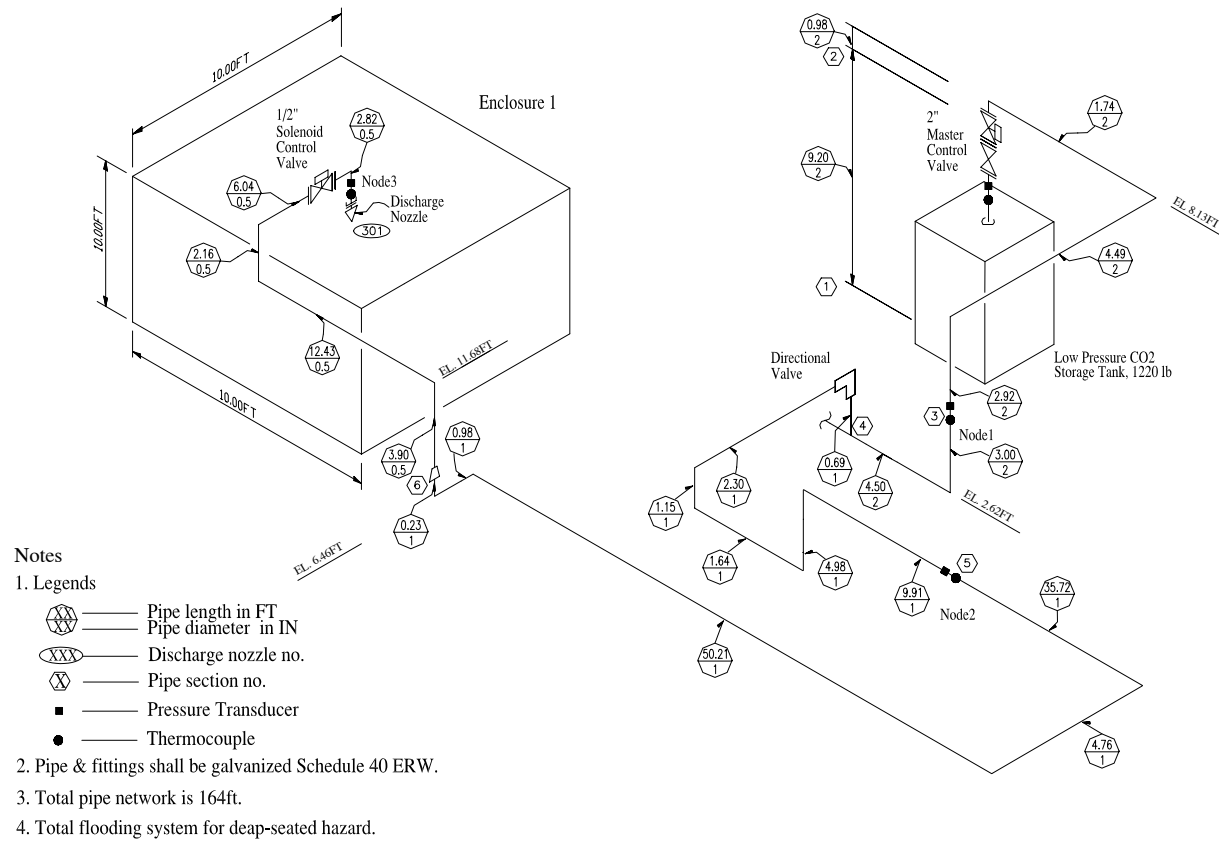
Isometric Piping Diagram for Test No. 1
